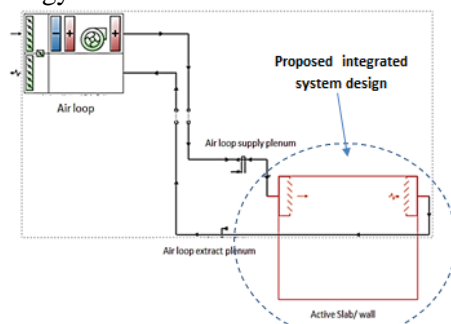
A typical air loop system layout integrated to active structure: air intake and outtake into zones naming active walls or active slabs (source: E+ detailed HVAC model) [16]
